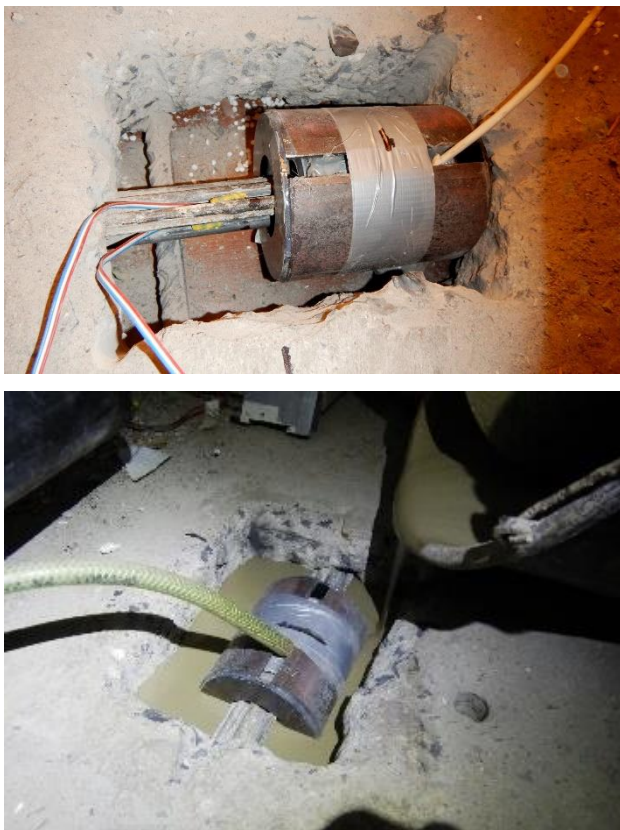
The fully equipped ME sensor installed on the prestressed cable in the inspected bridge (above) and consequent filling of the created opening by the special grout (below)
